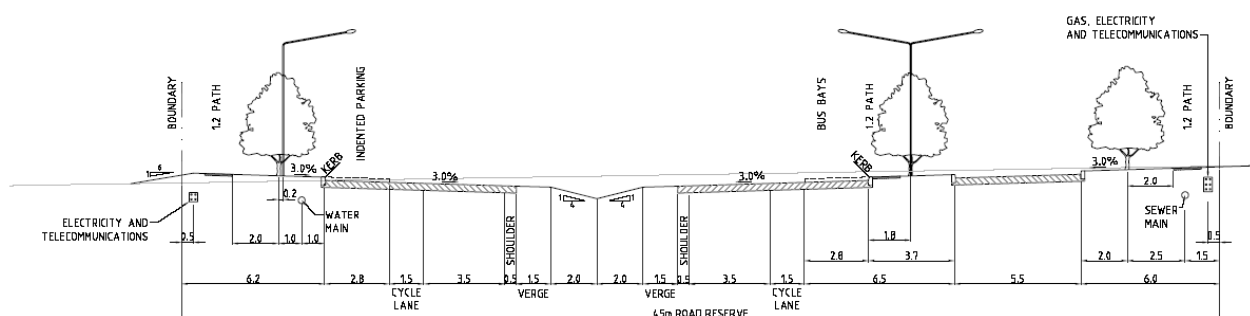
Typical Section: Suburban boulevard with service road at school
